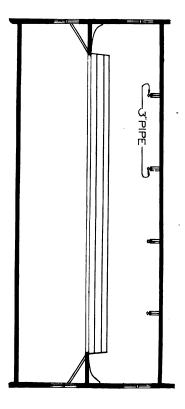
Typical Situation. Pipe Beams for Attaching Suspended Apparatus. These sketches represent a building in which the ceiling beam height is correct; for incorrect beam heights, see following sketches:
